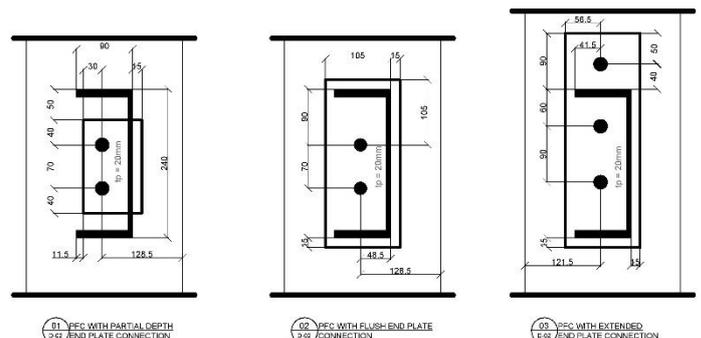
UPE 240 (PFC) Beam to SHS 250×250×16 Column bolted end plate connection details
